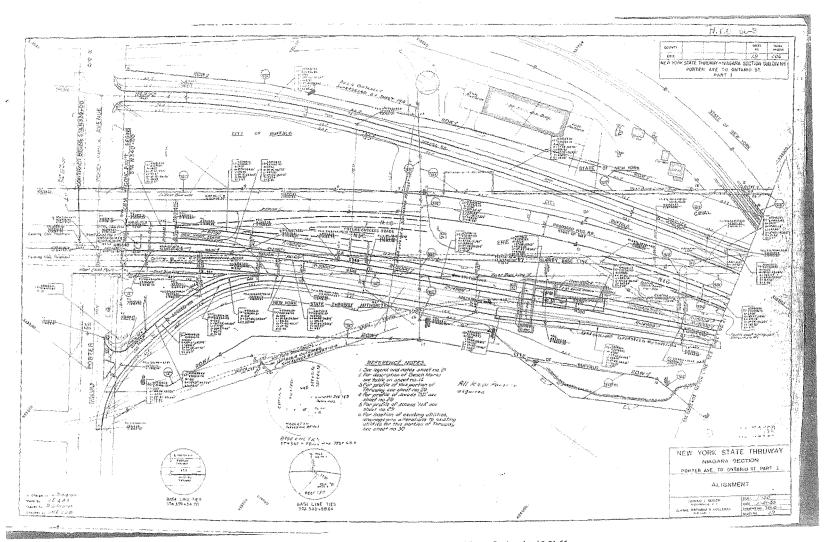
Alignment Sheet No. 19, New York State Thruway, Niagara Section, dated 3-21-55.
